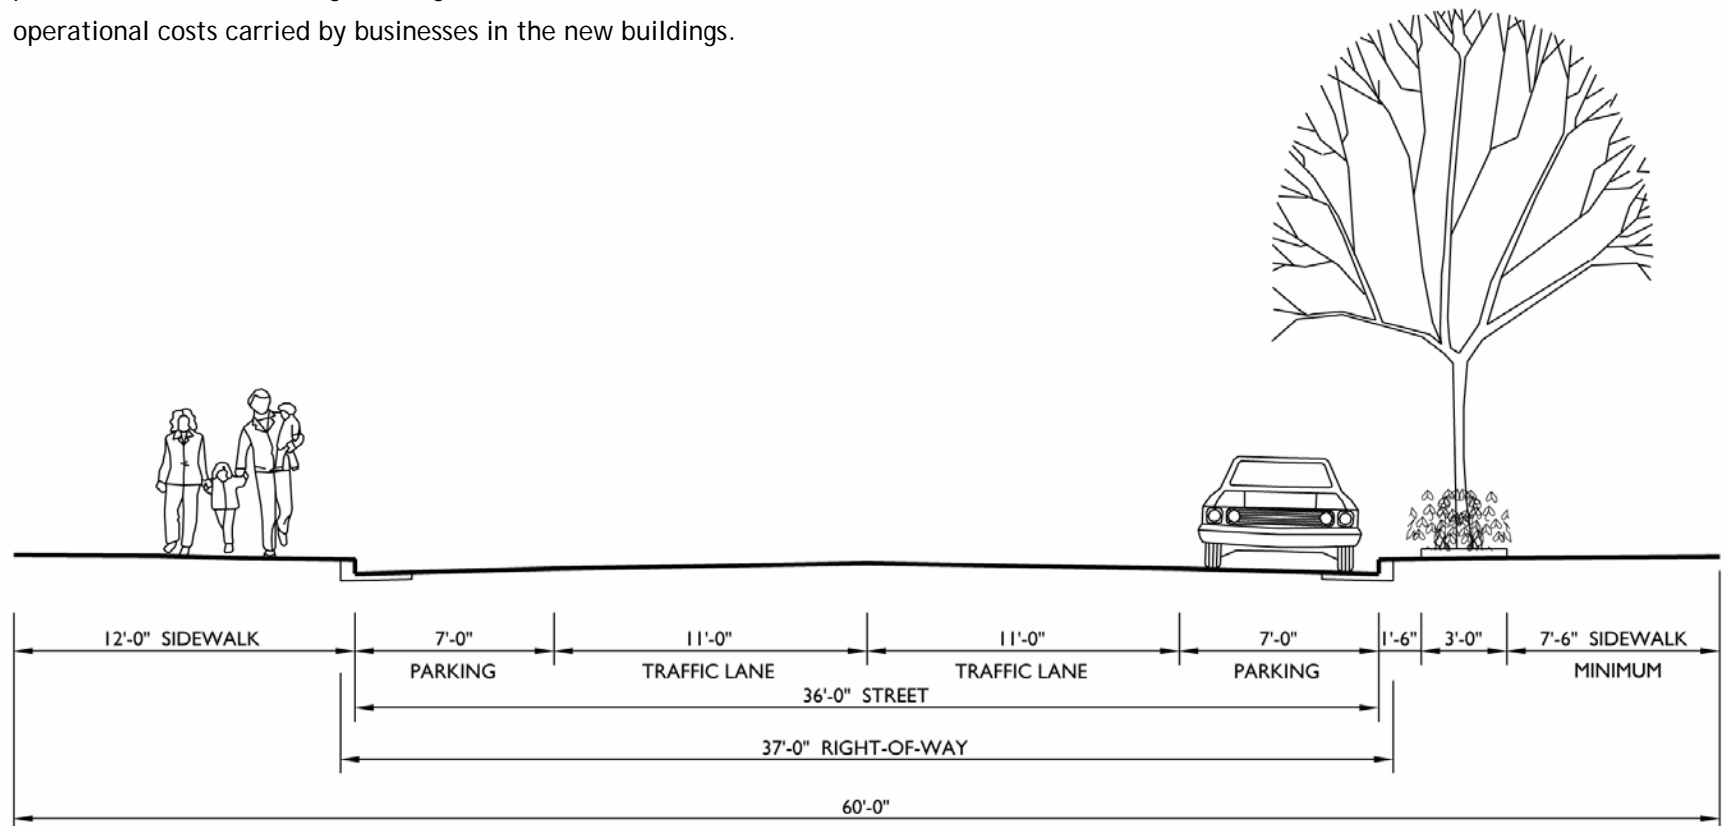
CROSS-SECTION PROPOSED EAST WEST STREET
